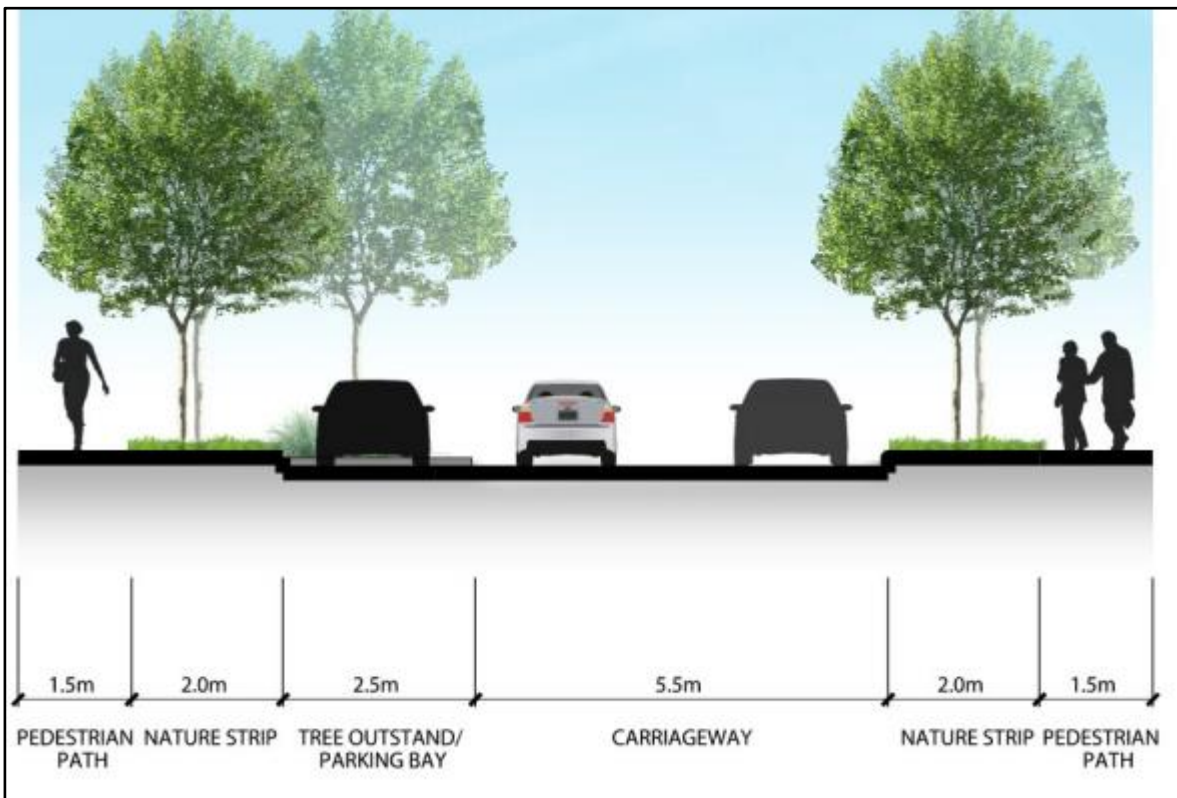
Access Street Cross Section (15m) – Shared Path Variation
